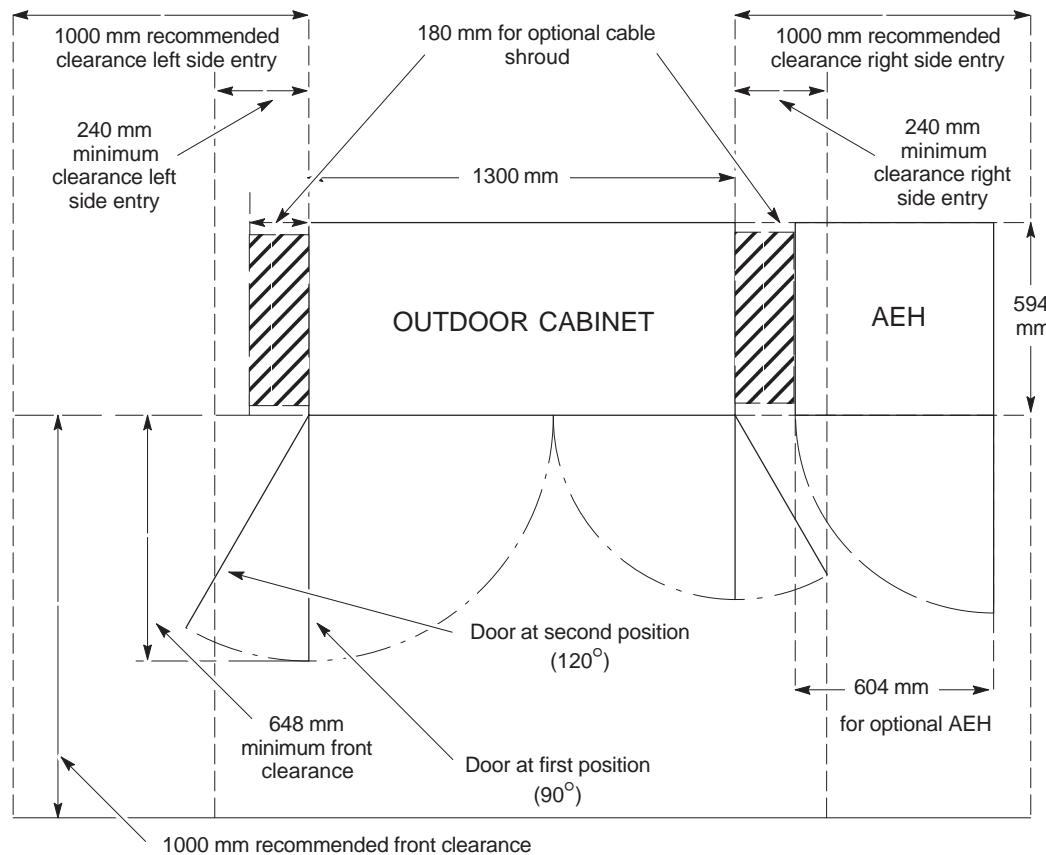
Outdoor cabinet site layout plan view (including optional equipment)
